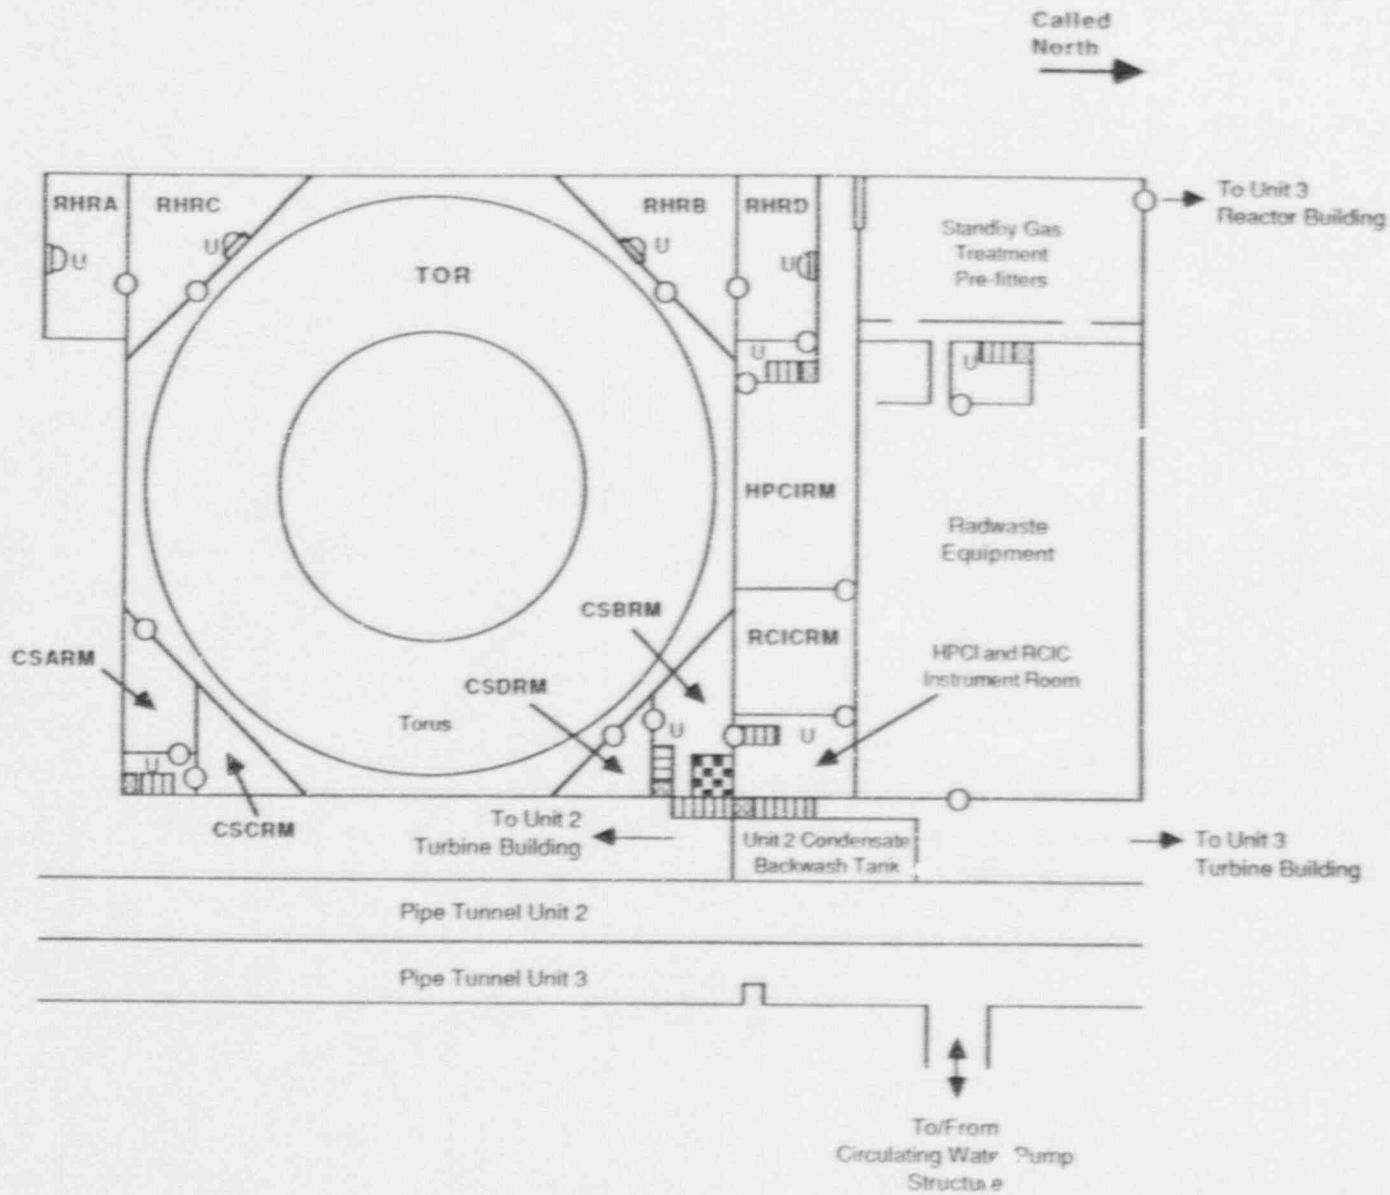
Peach Bottom 2 Reactor and Radwaste Building, Elevation 91'6" and Pipe Tunnels, Elevation 102'
